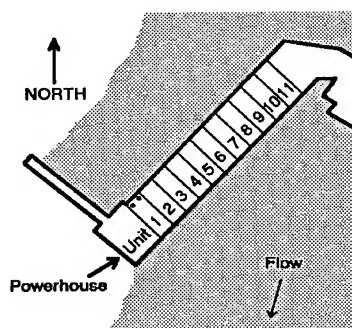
Plan view of Rocky Reach Dam powerhouse showing transducer mounting locations used during the springs of 1989-1992.
